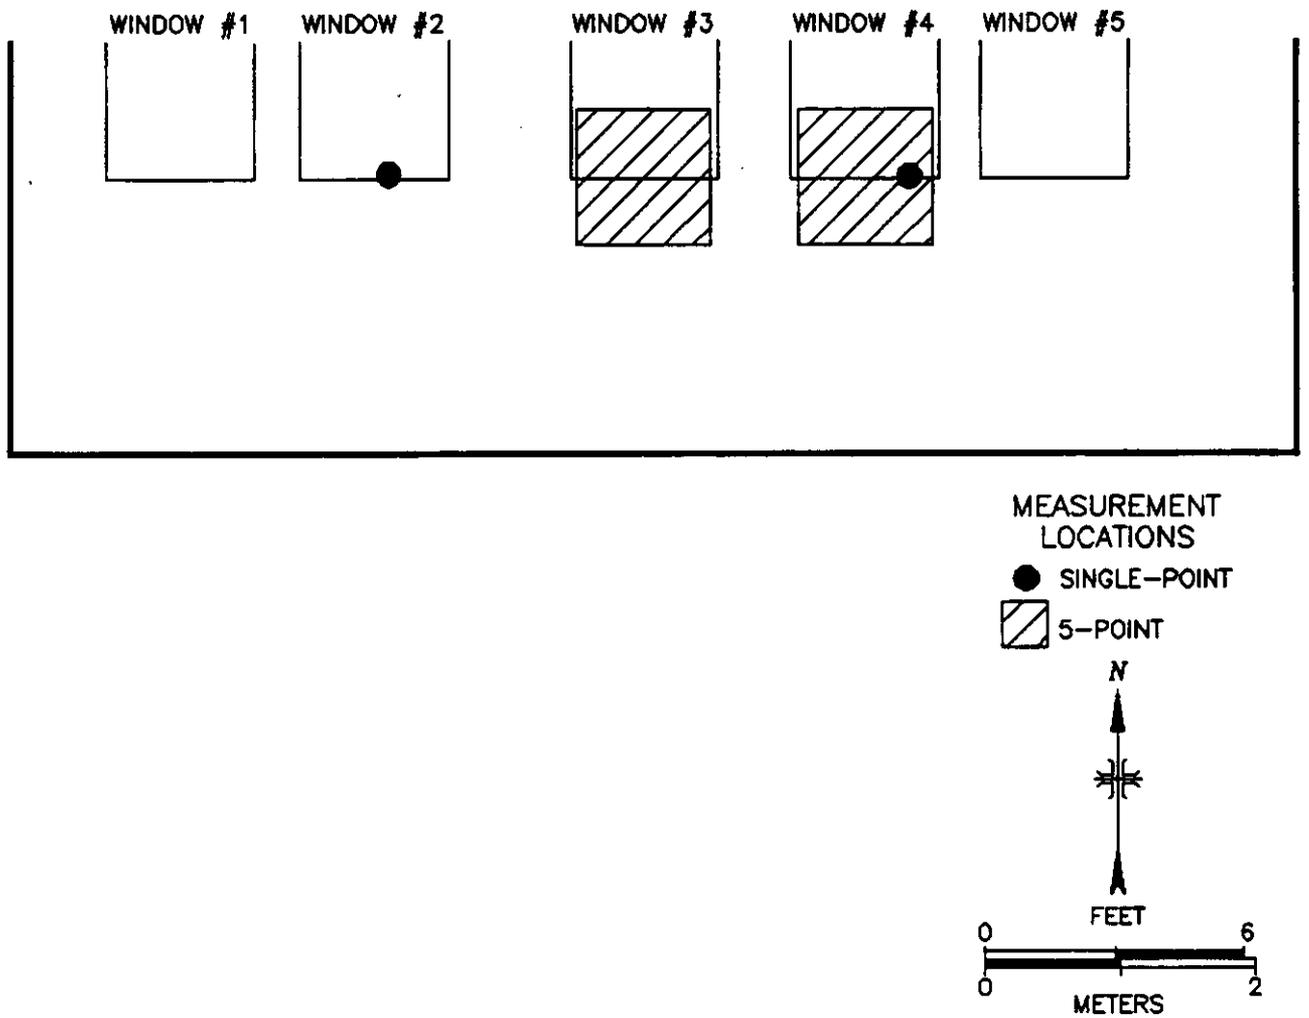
ARC Building 23, Outside Wall, Crusher Room
